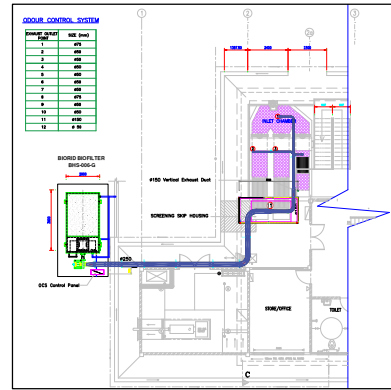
OCS Design Plan layout for a typical Sewage Pumping Station assumed applicable for this Project
